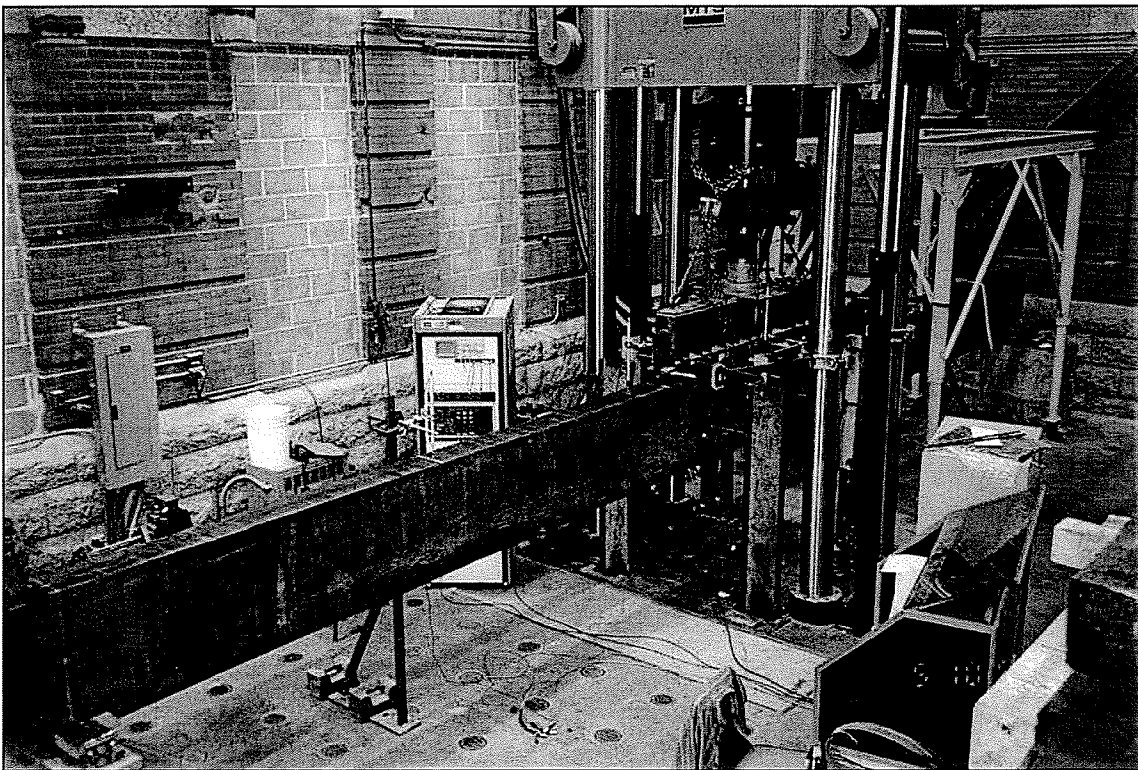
(c) –Full-scale beams: installation of C-BAR™
